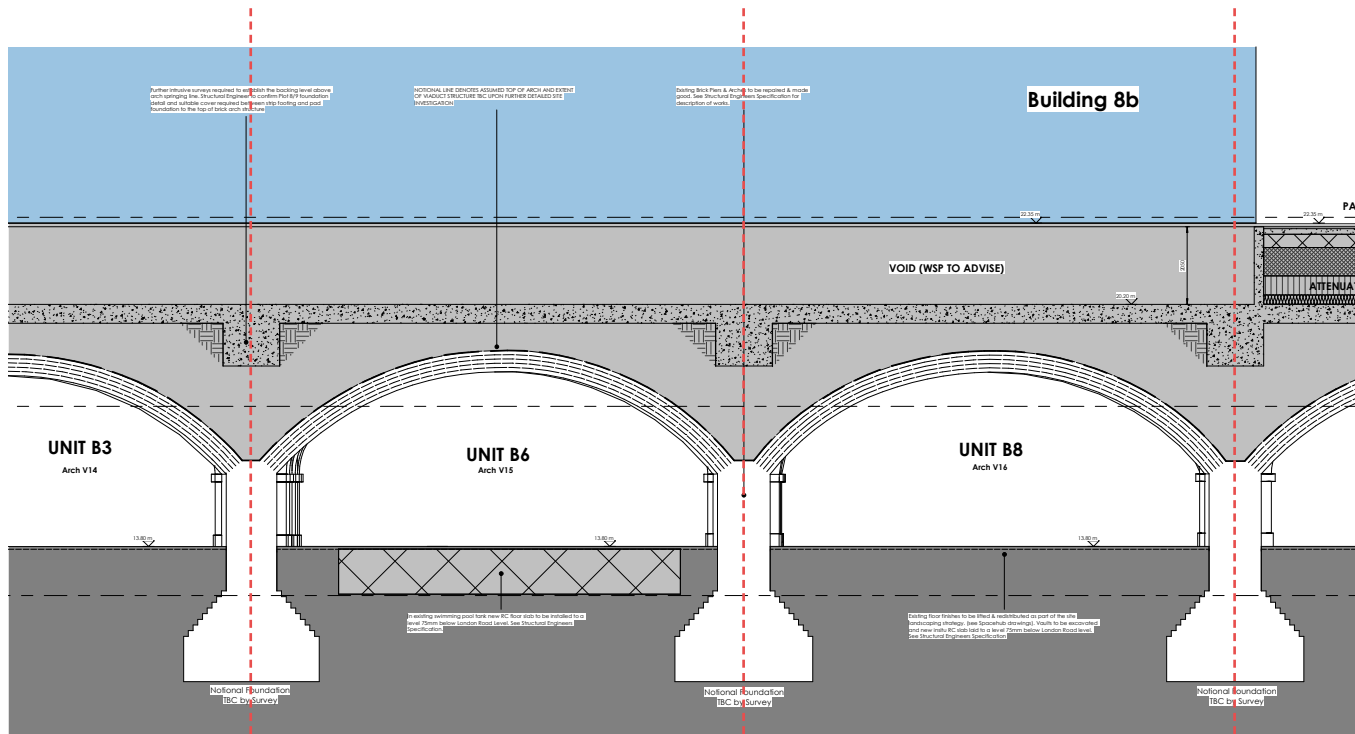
Section showing how non-load bearing ground floor slabs span between the foundations
